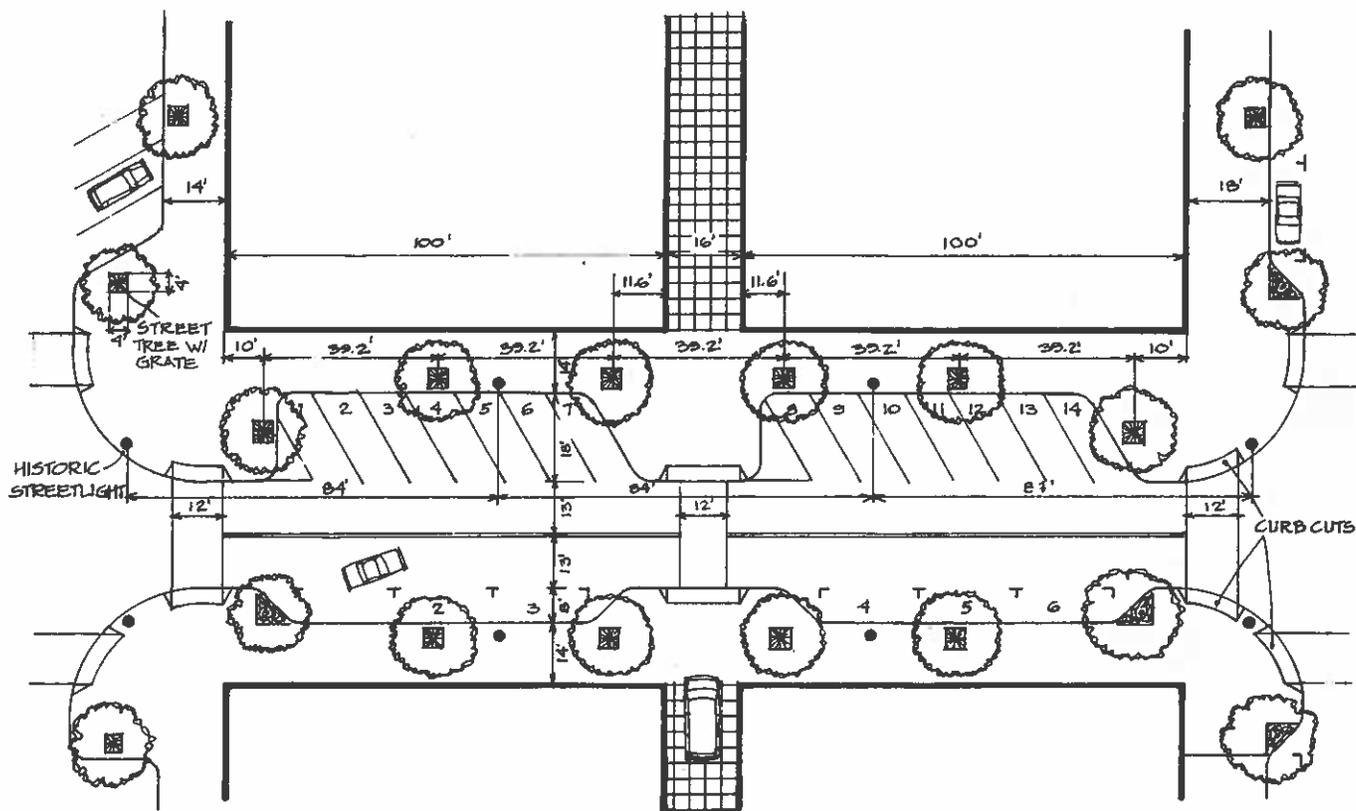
Court St. and Valley Ave. Streetscape, Parking and Alleyway Crossing Design
